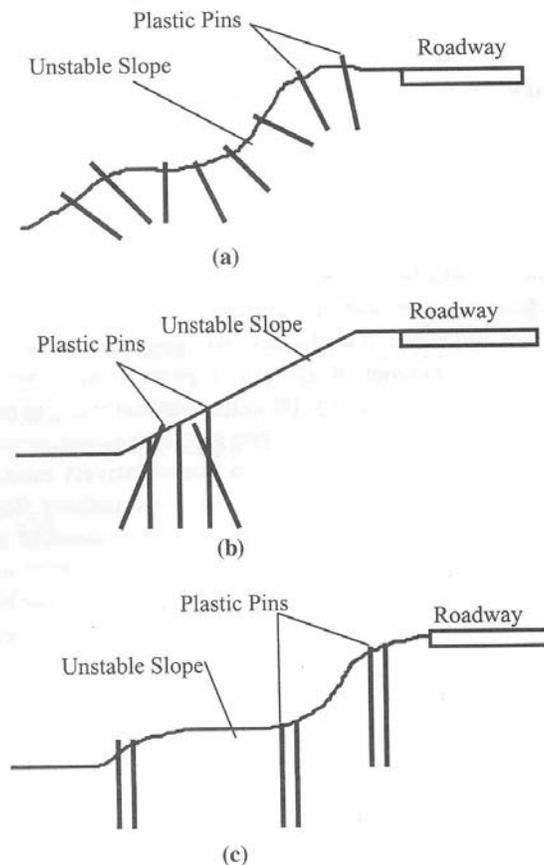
Potential schemes for slope stabilization using structural members: (a) soil nailing, (b) reticulated buttress, and (c) soil doweling (after Loehr et al., 2000).
